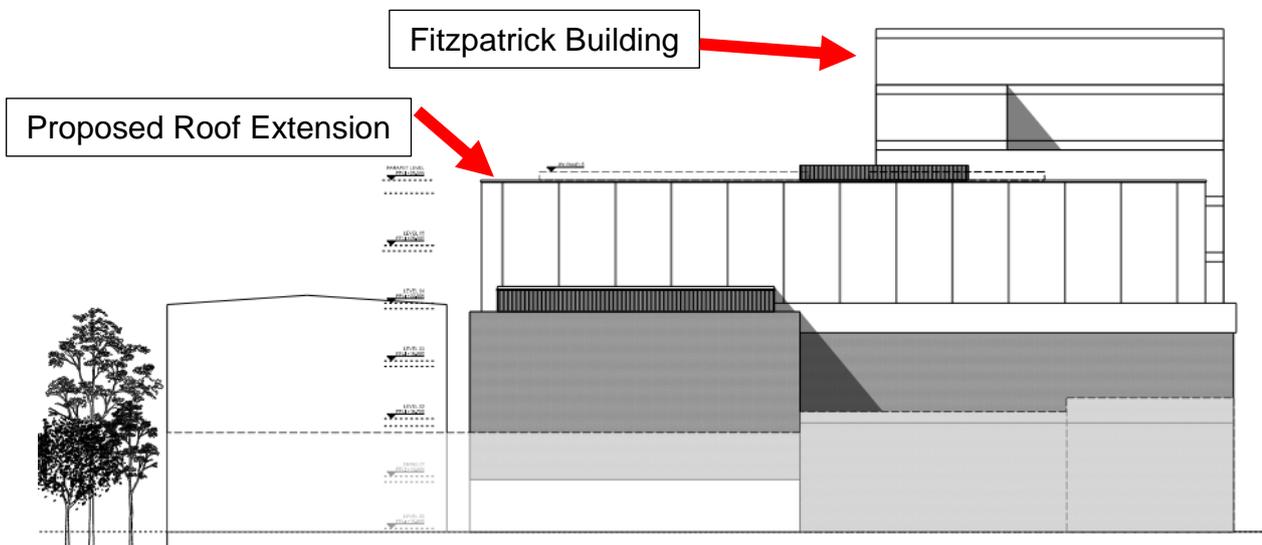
Proposed Eastern Elevation of 14-22 Vale Royal
